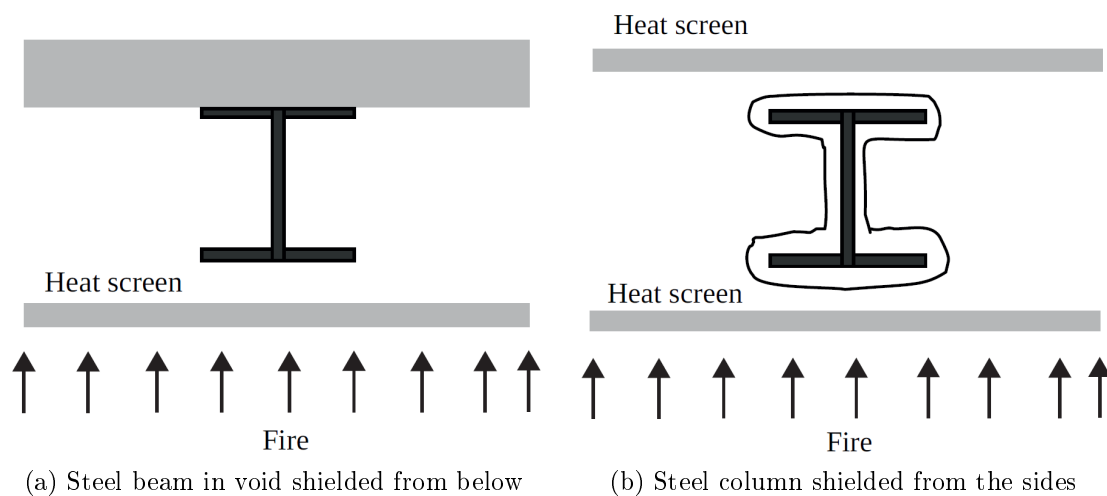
Horizontal (beams) and vertical (columns) heat screens protecting steel members from direct heat
